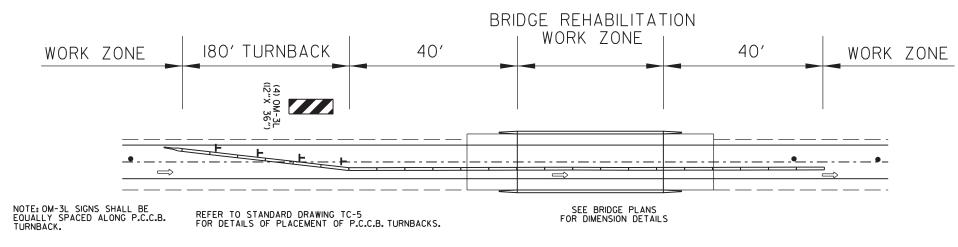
DETAIL OF RAMPS MAINTENANCE OF TRAFFIC DETAILS
